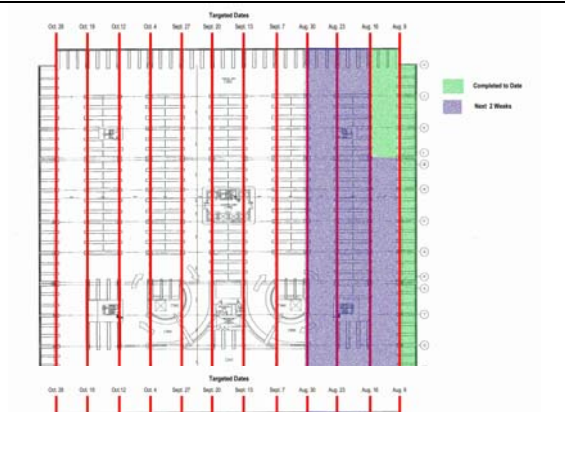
Demolition of the Old Terminal One – Parking Garage Demolition commencing from the east towards the west (Aug 6, 04)
